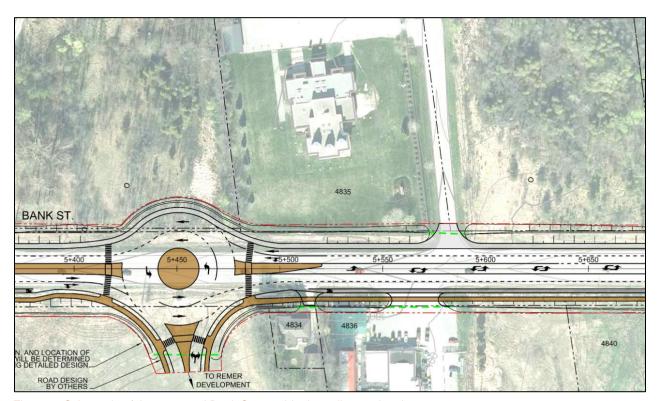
Schematic of the proposed Bank Street widening adjacent the site.
